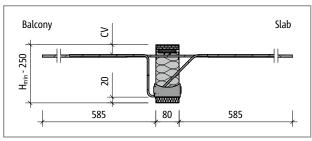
Schöck Isokorb® T type K-M5 and K-M6: Product section
